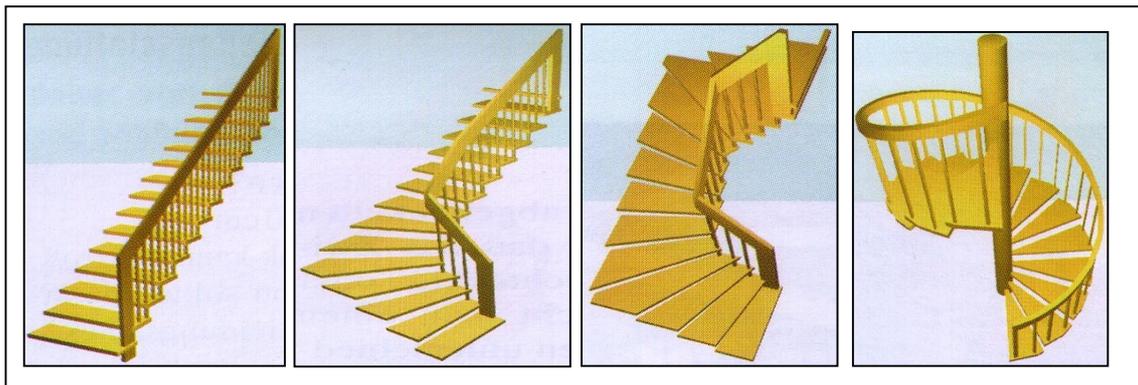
Examples of different ground plans of stairs to be tested in the test facility
